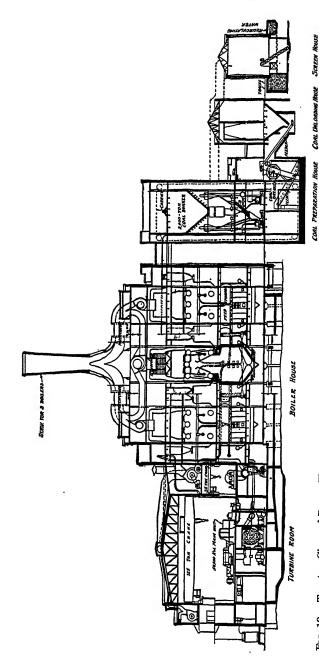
Trenton Channel Power House, section through plant looking north. Pulverized fuel. Each boiler has 29,343 sq. ft. of heating surface. Steam delivered at 375 lb., 700°F. (Courtesy of Detroit Edison Company.)
